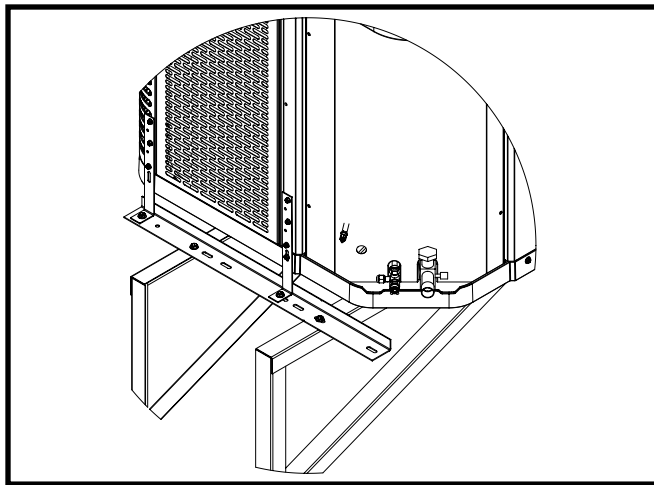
Rear Brackets For Large Footprint - Control Panel Right
